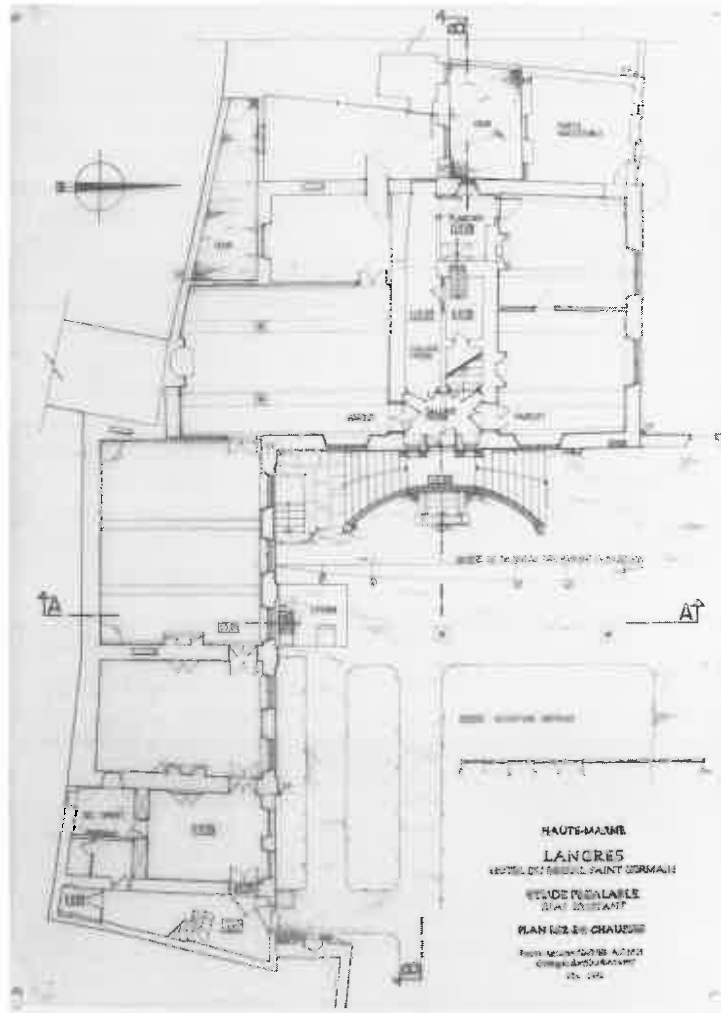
Breuil Mansion—First floor plan, existing condition [1].
